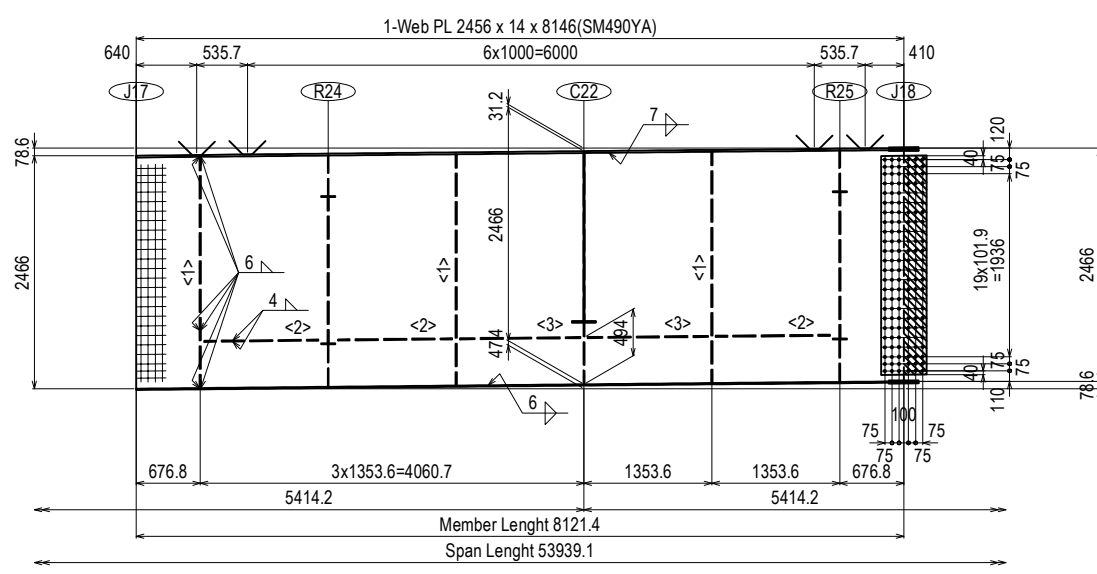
DETAIL OF MAIN GIRDER G1 (PF2-PF5) (18) S=1:80
